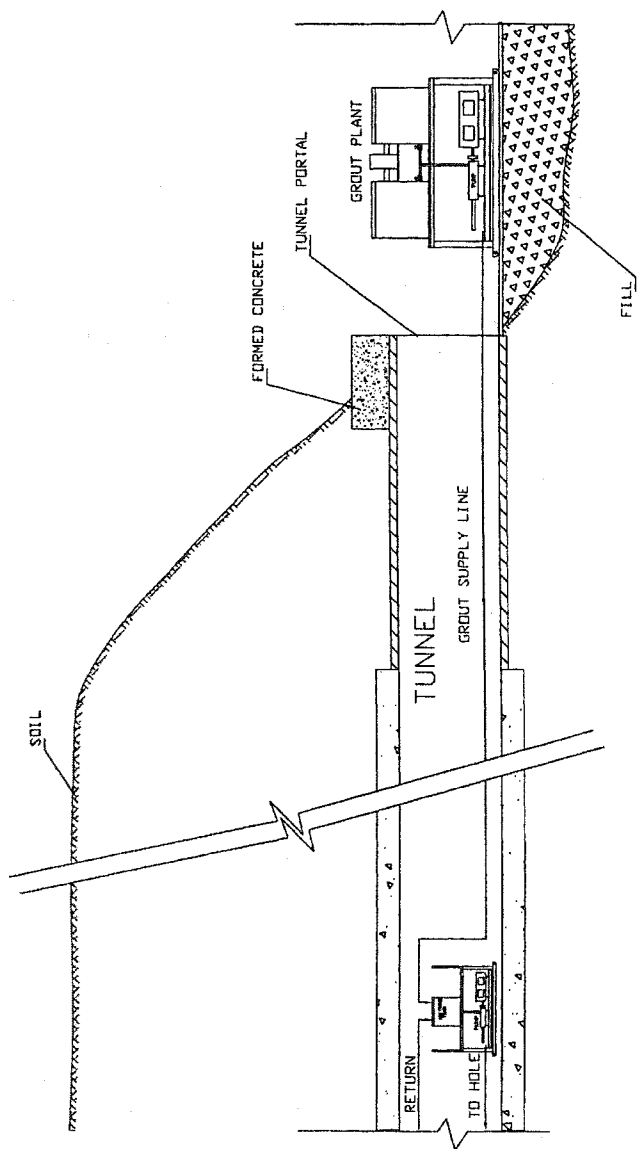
Large Colloidal Mixing Plant Set Up outside Tunnel Portal
